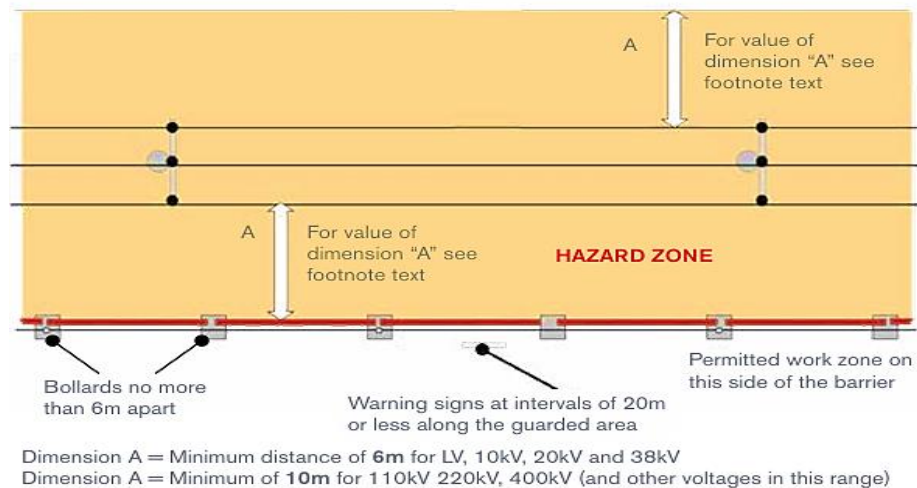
Elevation and Plan for a site where plant and machinery will not pass under electricity lines
